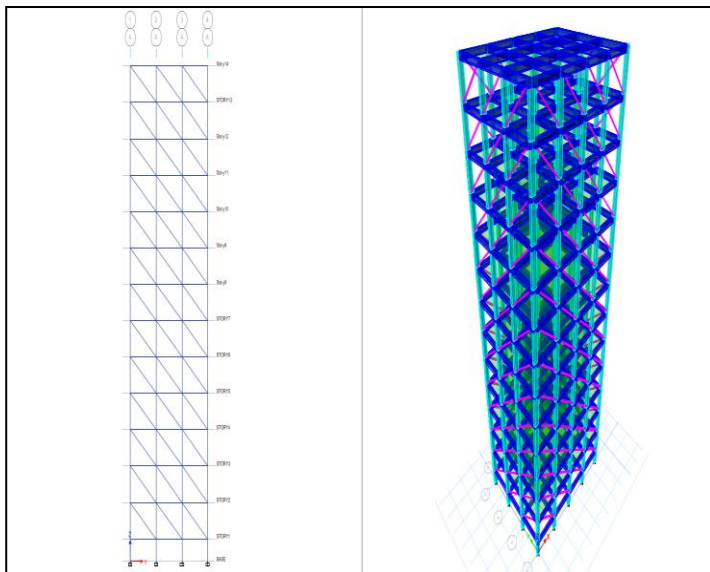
Elevation and 3D view of RC frame structure with diagonal bracing
